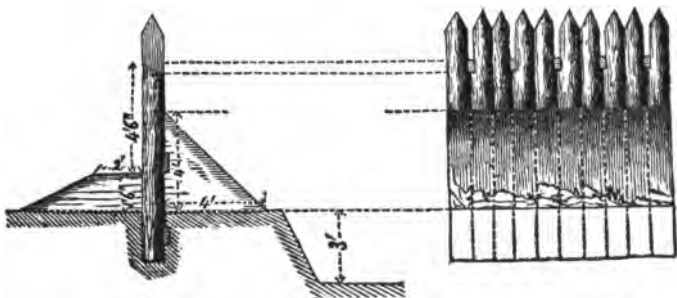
SECTION AND ELEVATION OF A STOCKADE.
